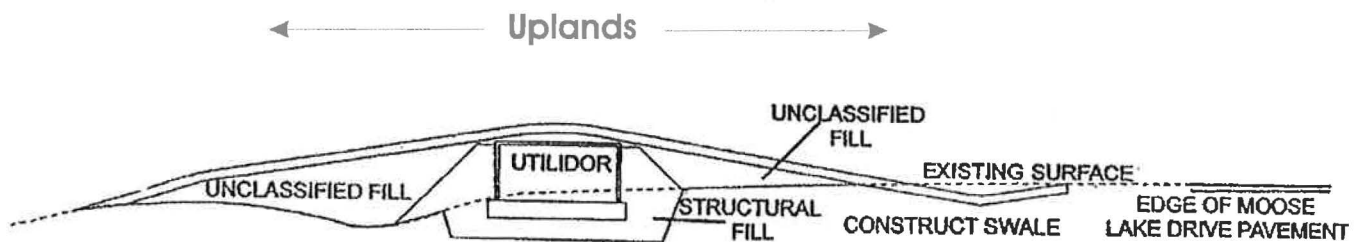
Cross-section of Typical Utilidor Construction in Uplands
